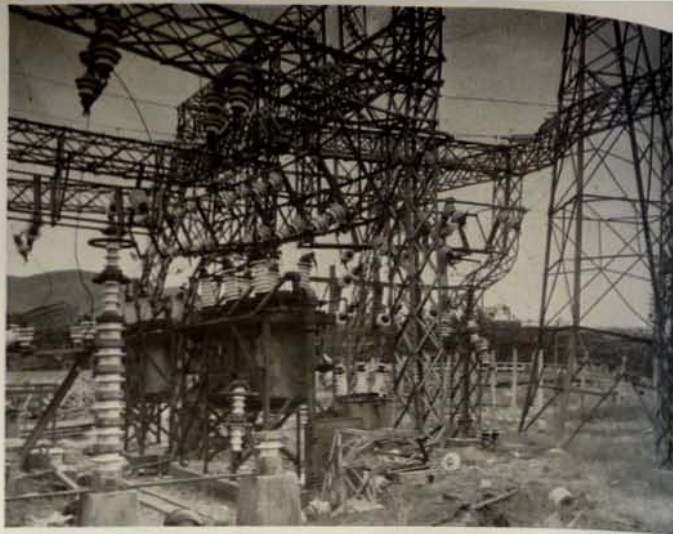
3,600 feet from GZ. Looking southeast at distorted member supporting high voltage switch rack, Takenokubo Substation.
